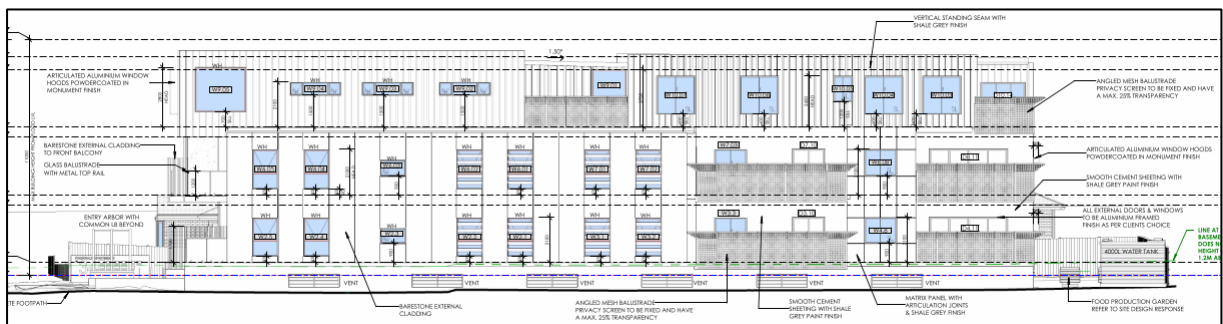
Northeast elevation showing presentation to adjoining land at 32 Barrabool Road. Source: Application documents.
